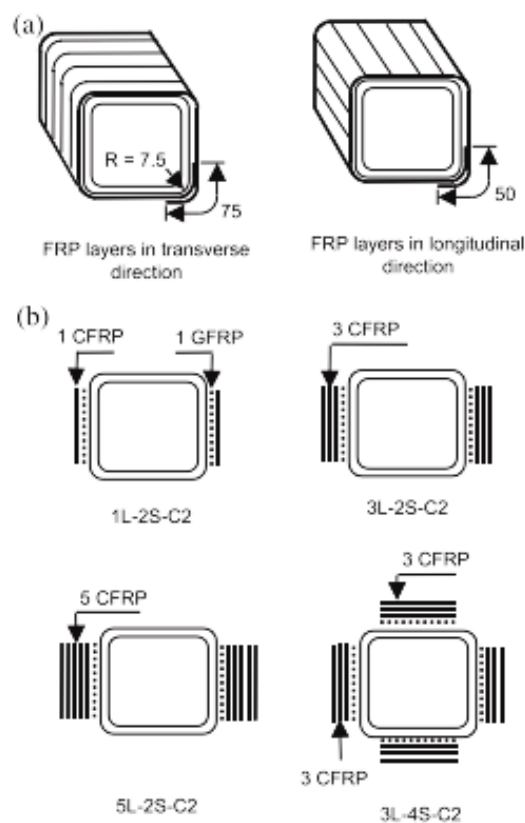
Details of FRP strengthening configurations: (a) short and (b) long columns.
